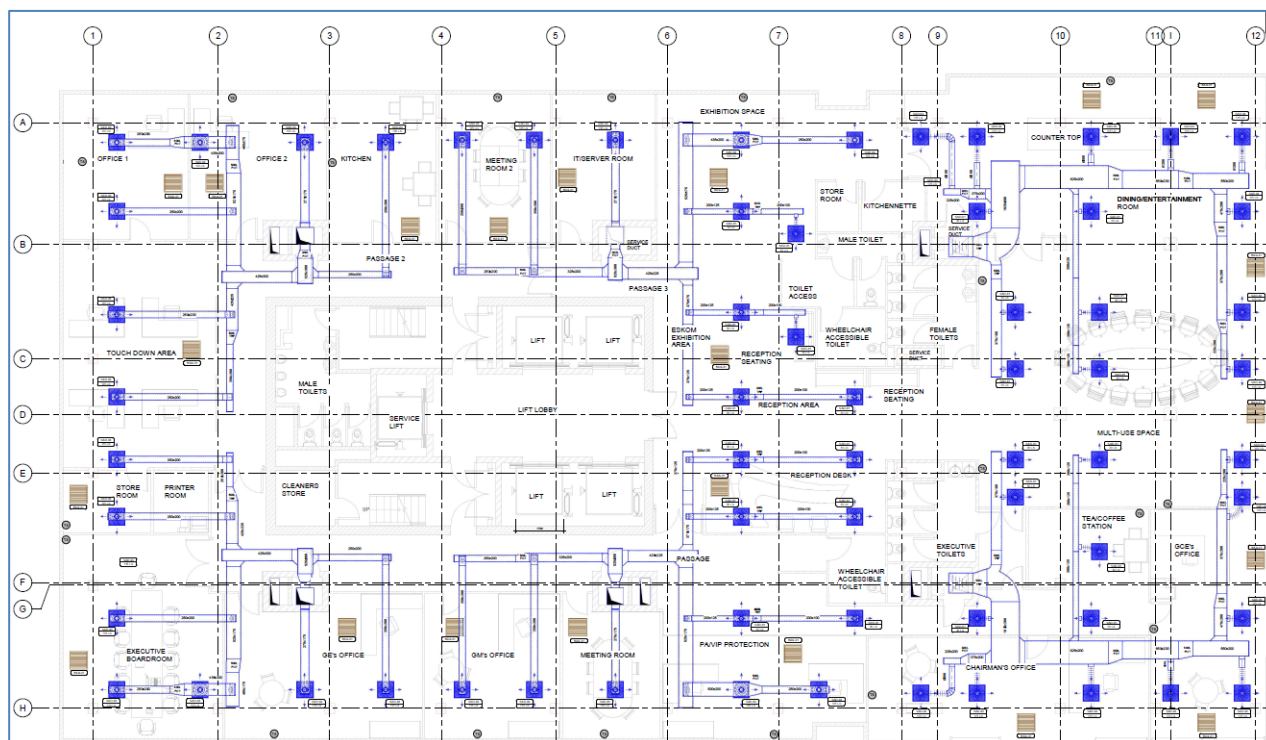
8th Floor Thibault Square Building HVAC ducting arrangement.
